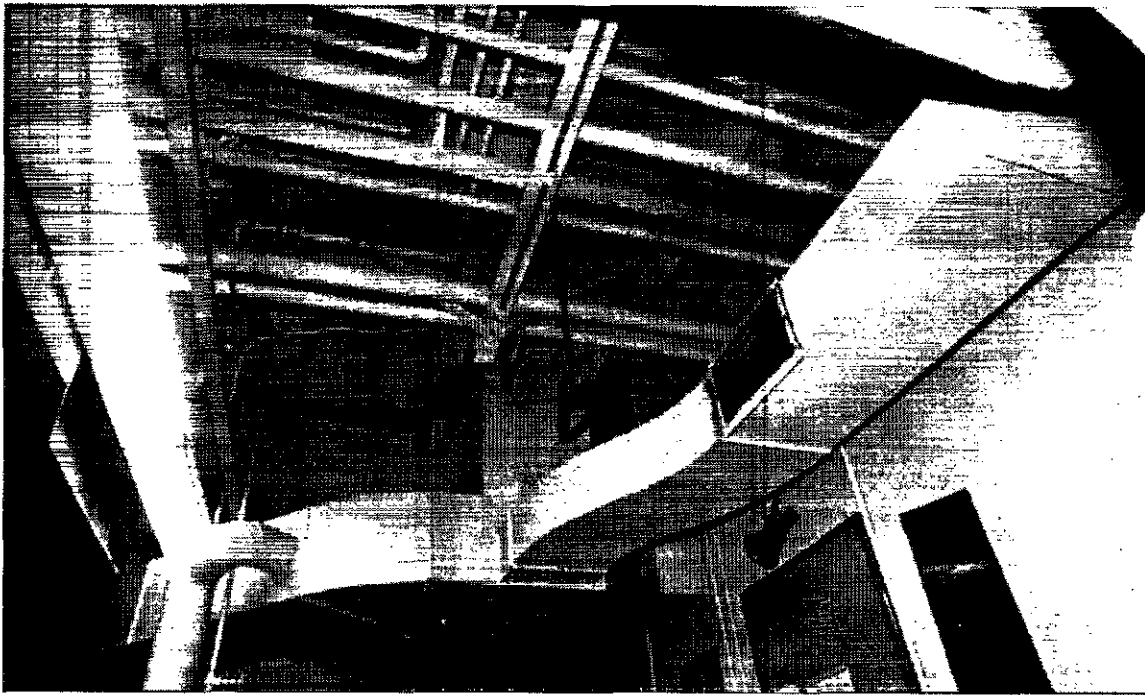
Typical lighting, piping and ducting in the former Helium Laboratory.
